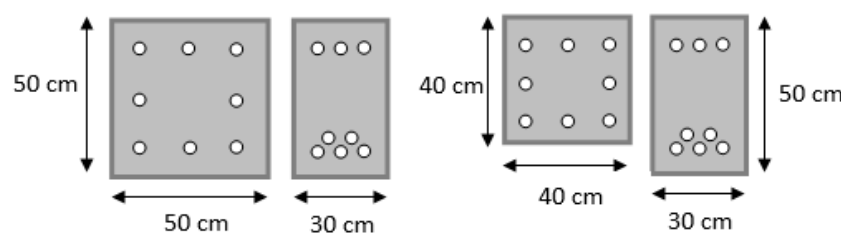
First hypothesis cross-sections adopted for the dimensioning of the structure in location 1 and 2 respectively on the left and the right, with a possible configuration of longitudinal reinforcement
